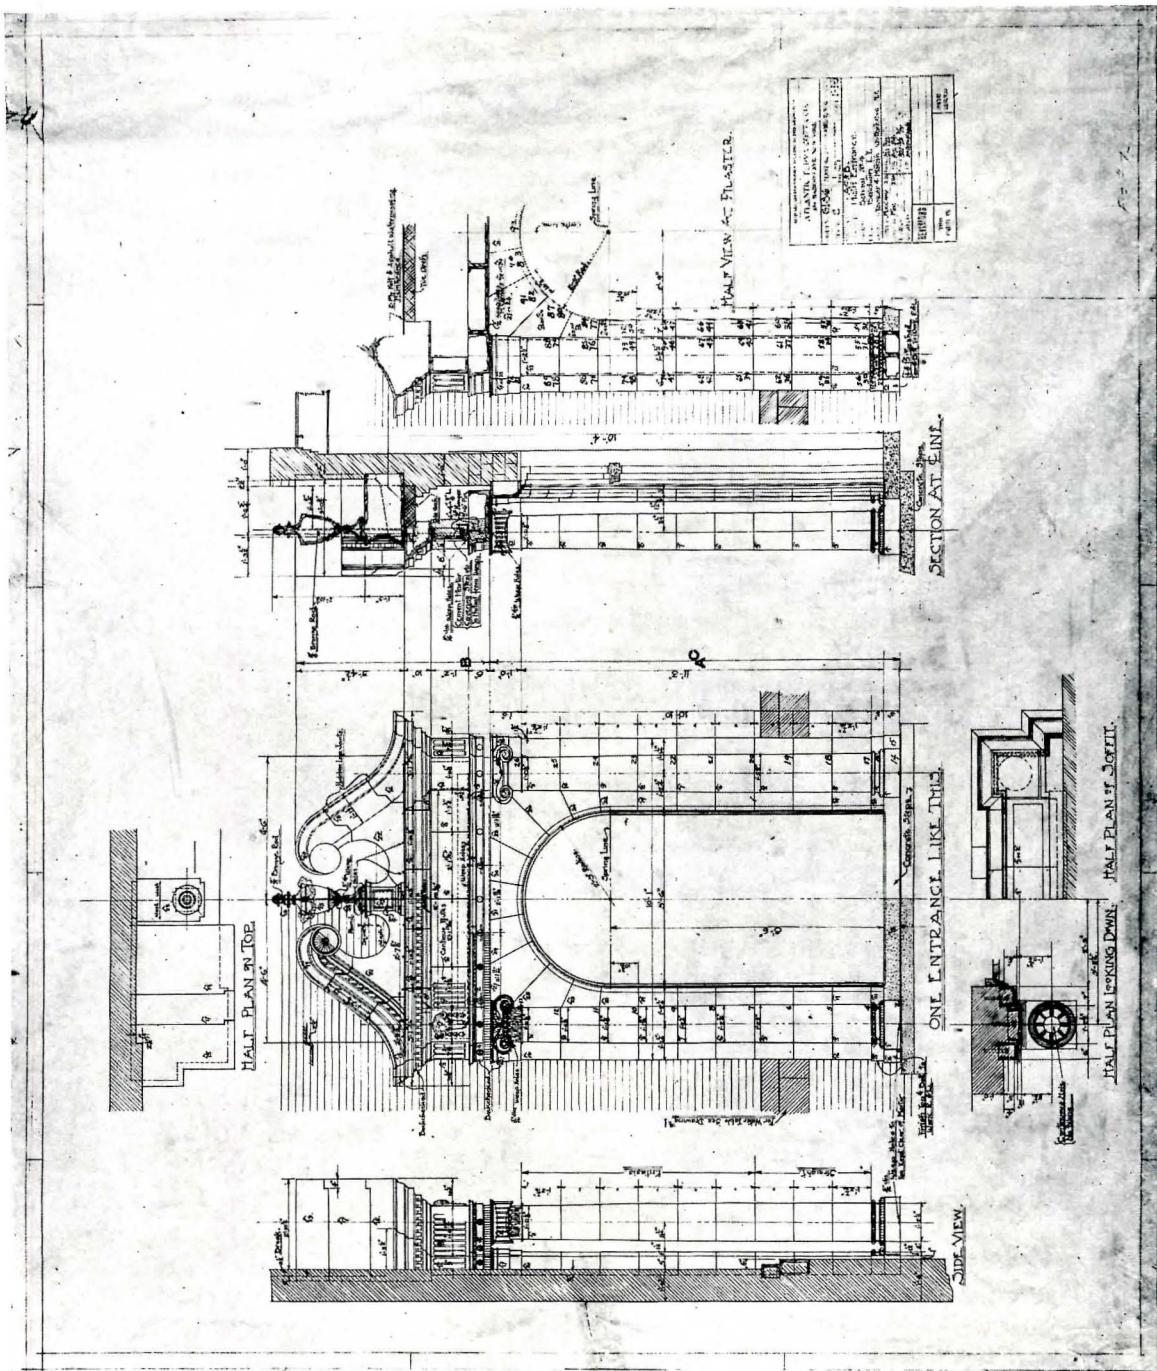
Terra Cotta Shop Drawing of an Entrance Door Feature of a School Building.
